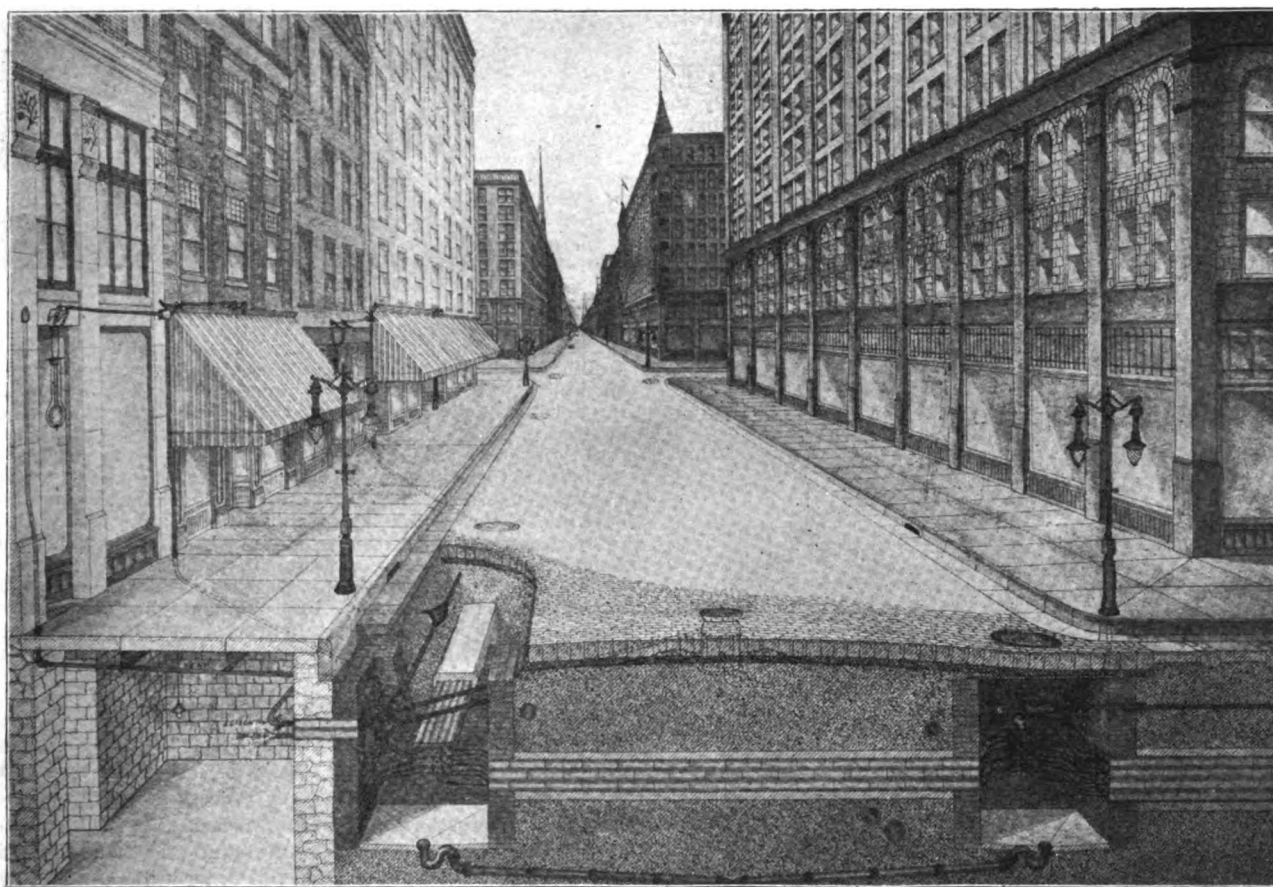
VIEWS OF CONDUIT AND MANHOLE CONSTRUCTION, ROCHESTER, N. Y.
